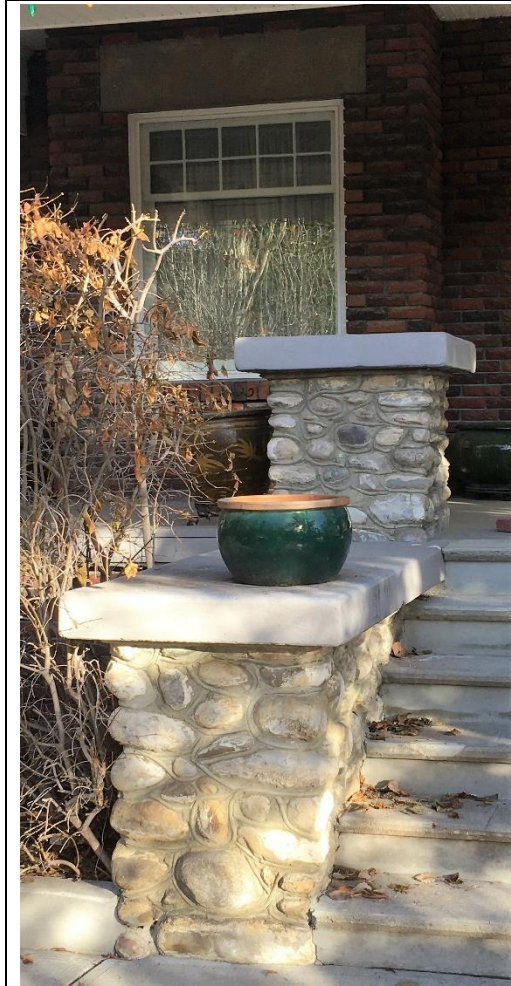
Detail of ten-over-one single hung projecting square window; concrete header; fieldstone-clad stairway pedestals; and mortar beading and concrete caps
